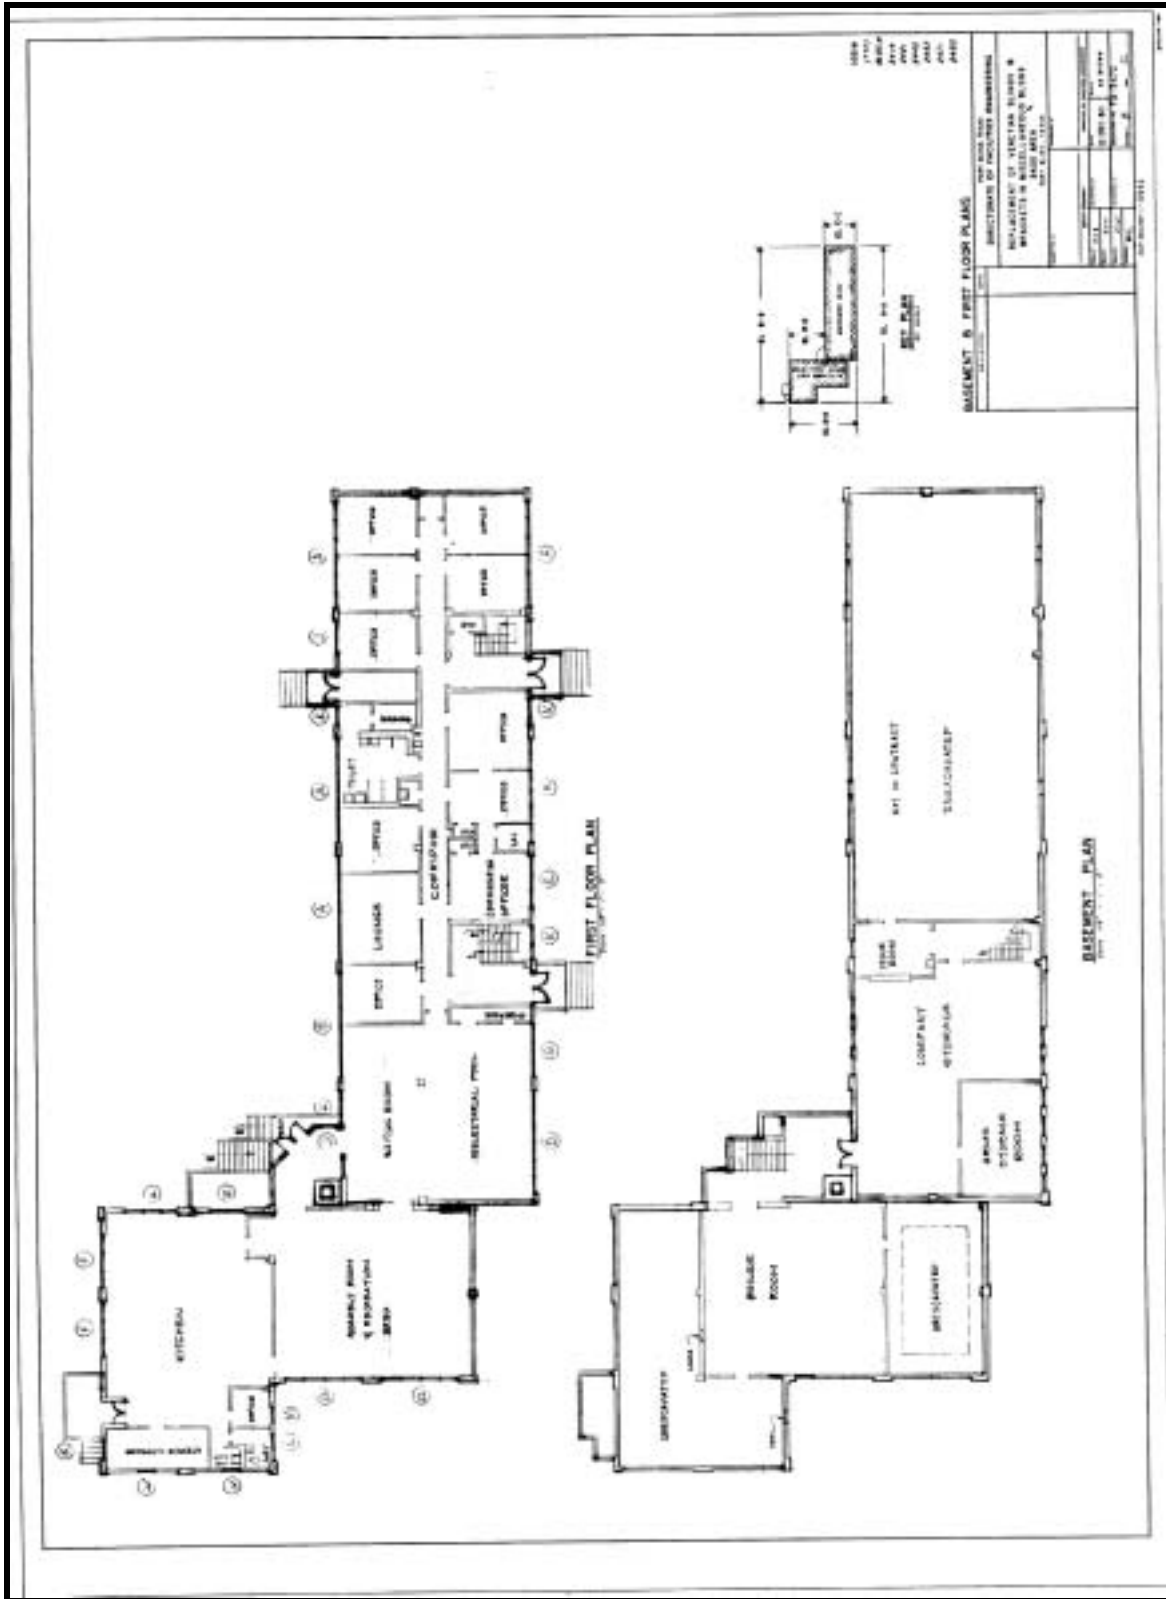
105-man hammerhead barracks, floor plan, barracks wing, basement and 1st floor (1980) (Engineering, Ft. Bliss).
